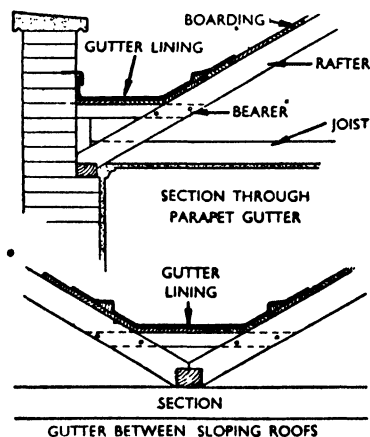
Valley and parapet gutters to pitched roofs. Gutters are flexible metal or asphalt laid on boarding with supporting bearers under. The "carry up" of the material on the sides must be sufficient to allow storm water to get away without backing up.
